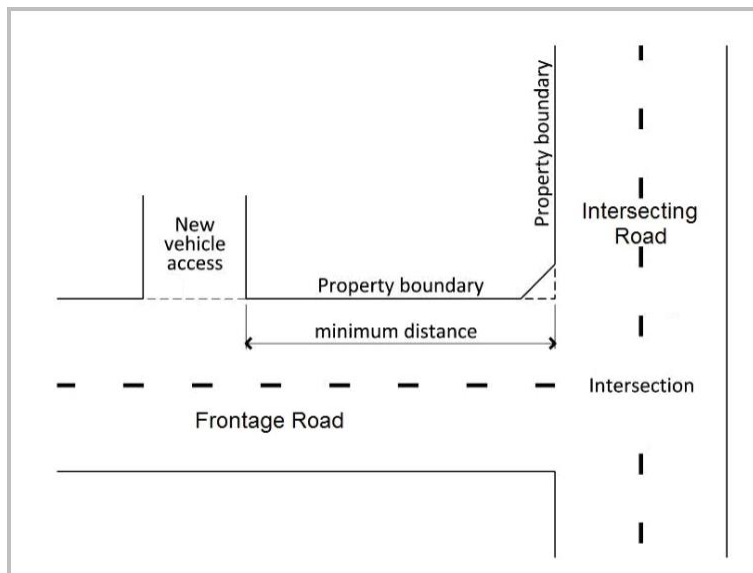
Christchurch District Plan – Figure 16 – Minimum distance of vehicle crossing from intersections outside the Central City
